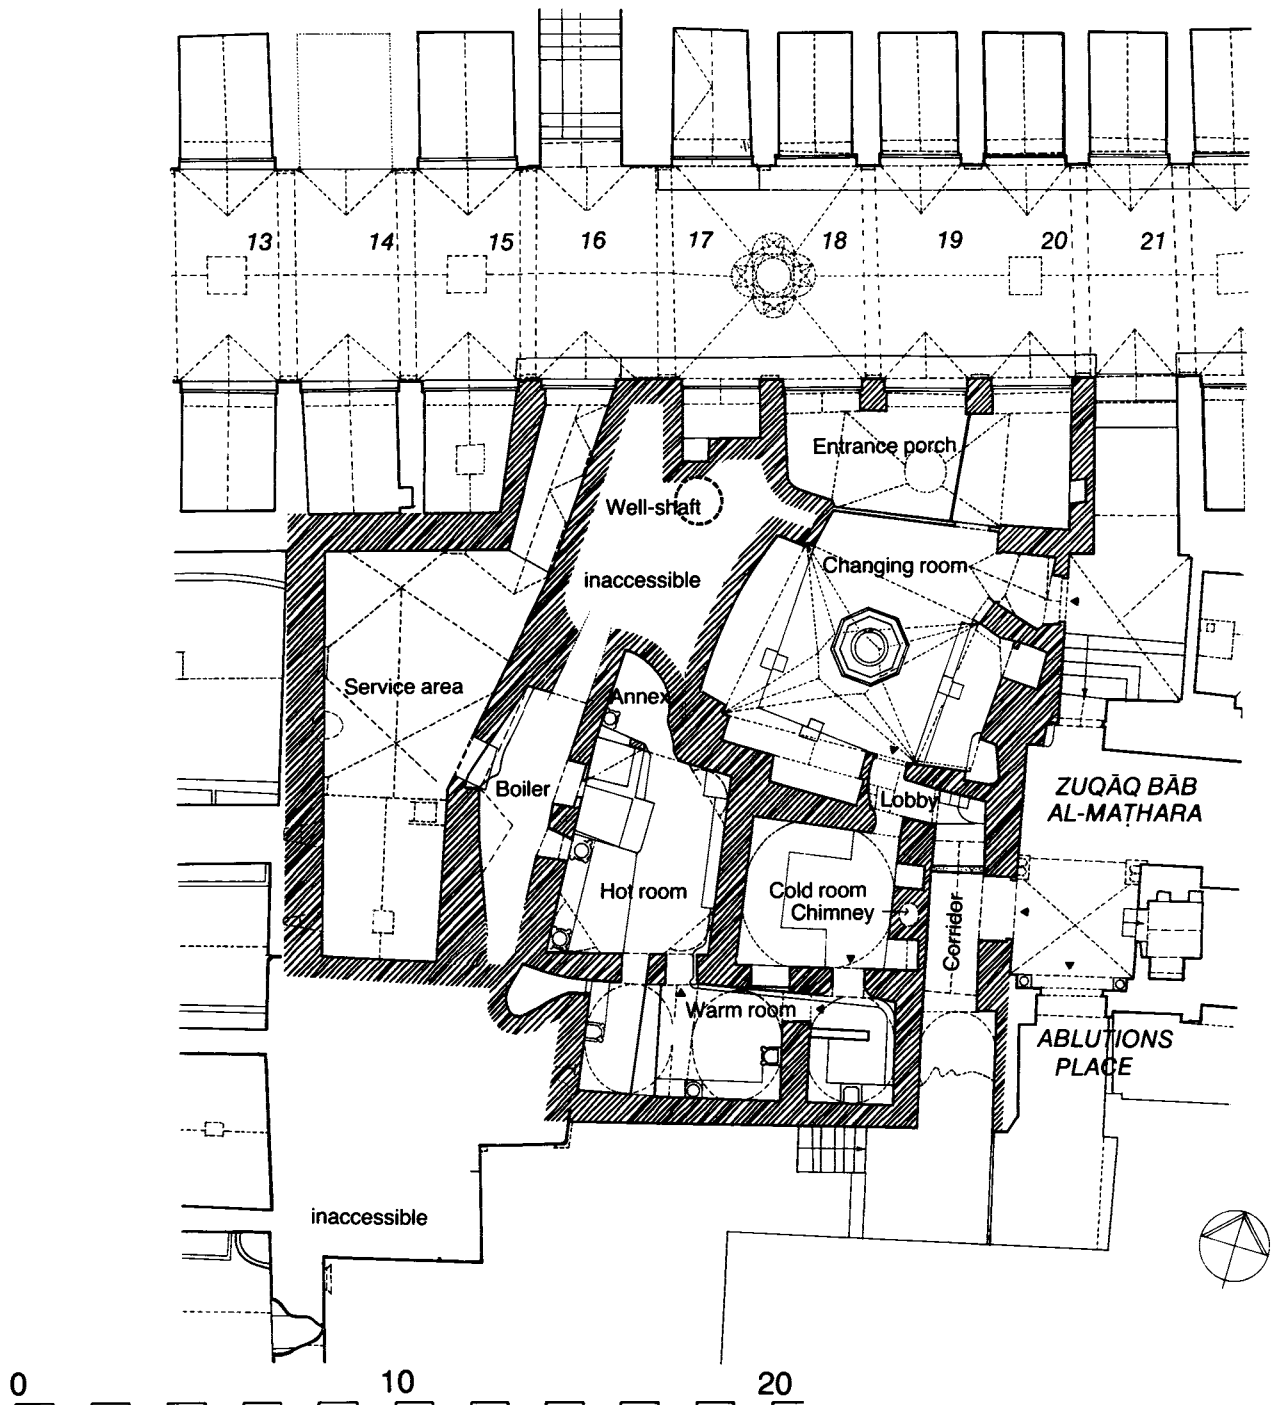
Ḥammām al-Shifā': Ground floor plan
